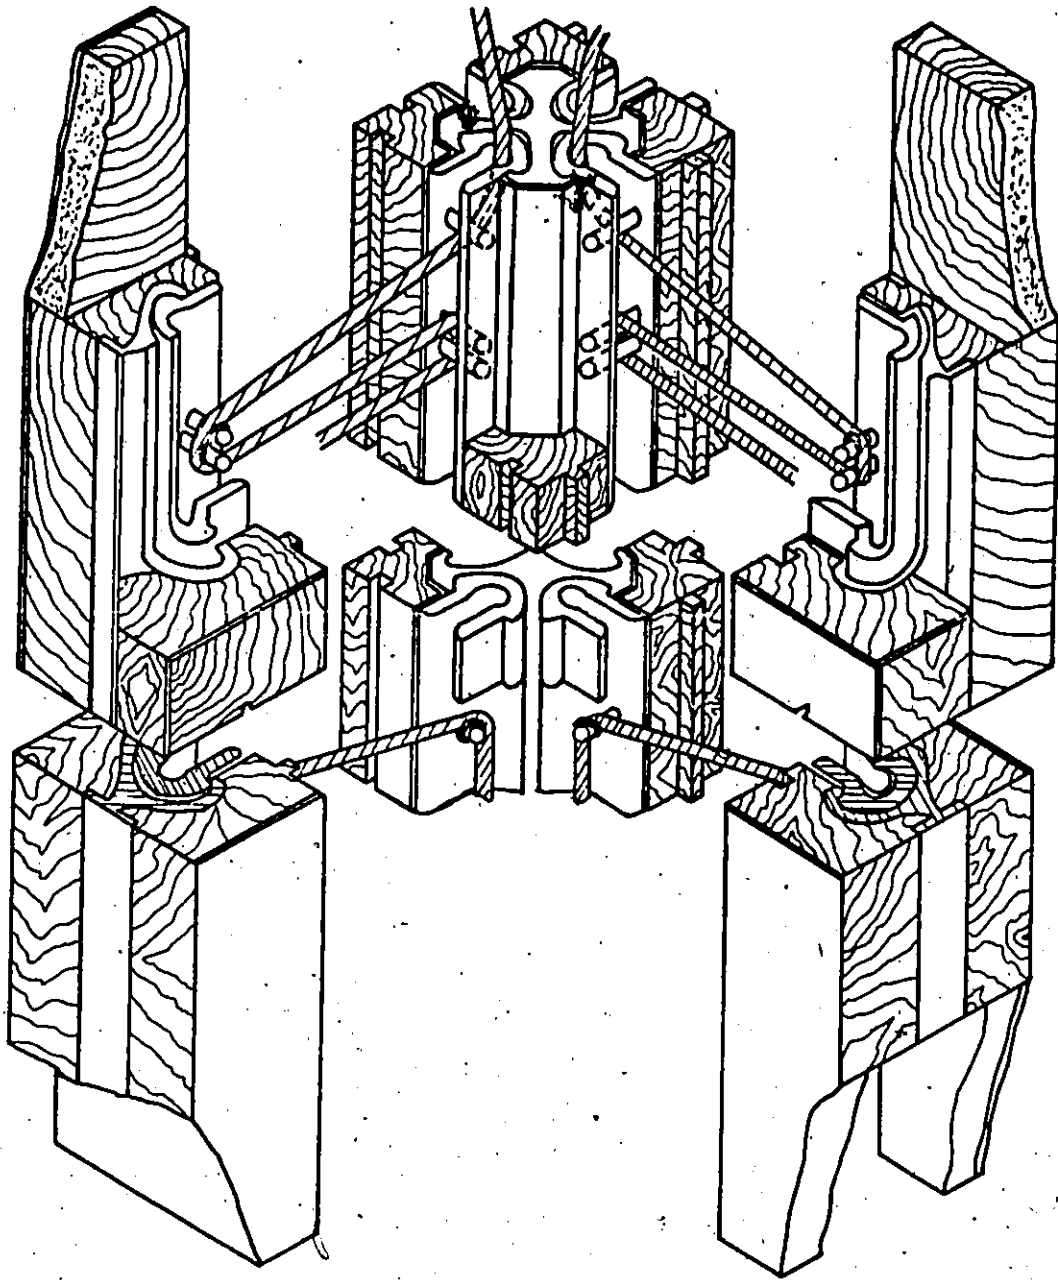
JOINING TWO PANELS TO FORM A CORNER
